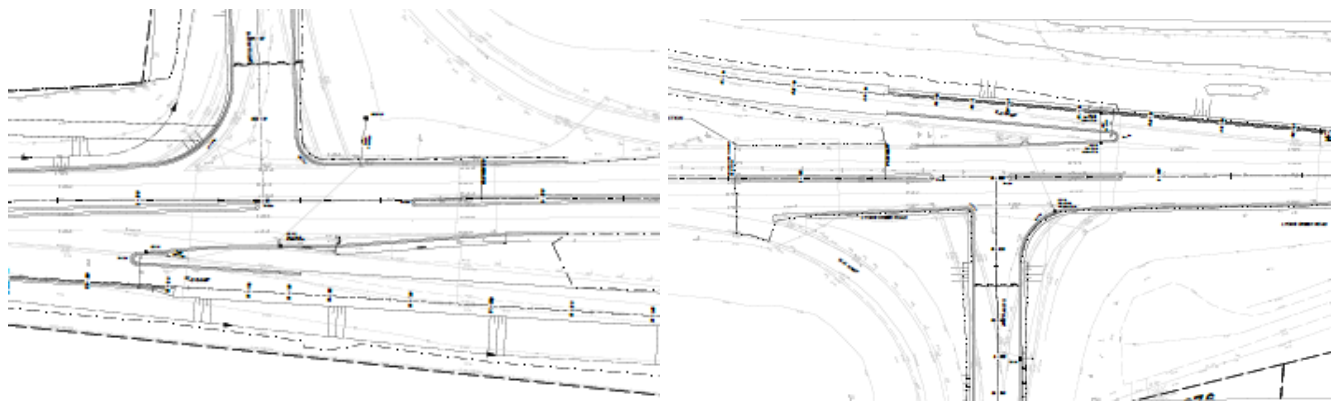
QEW RAMP TERMINAL INTERSECTIONS
